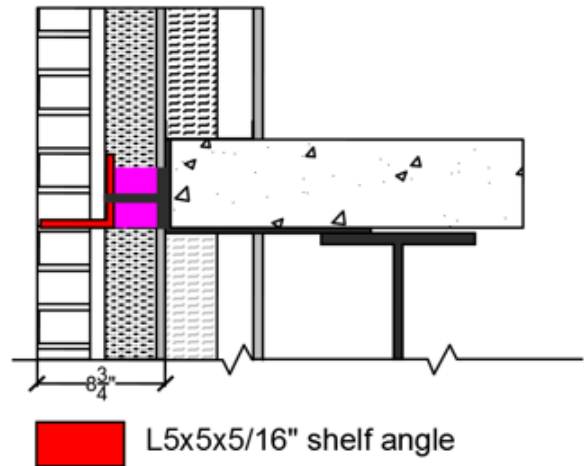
Section view of two slab-supported shelf angle specimens with constant wall cavity thicknesses
